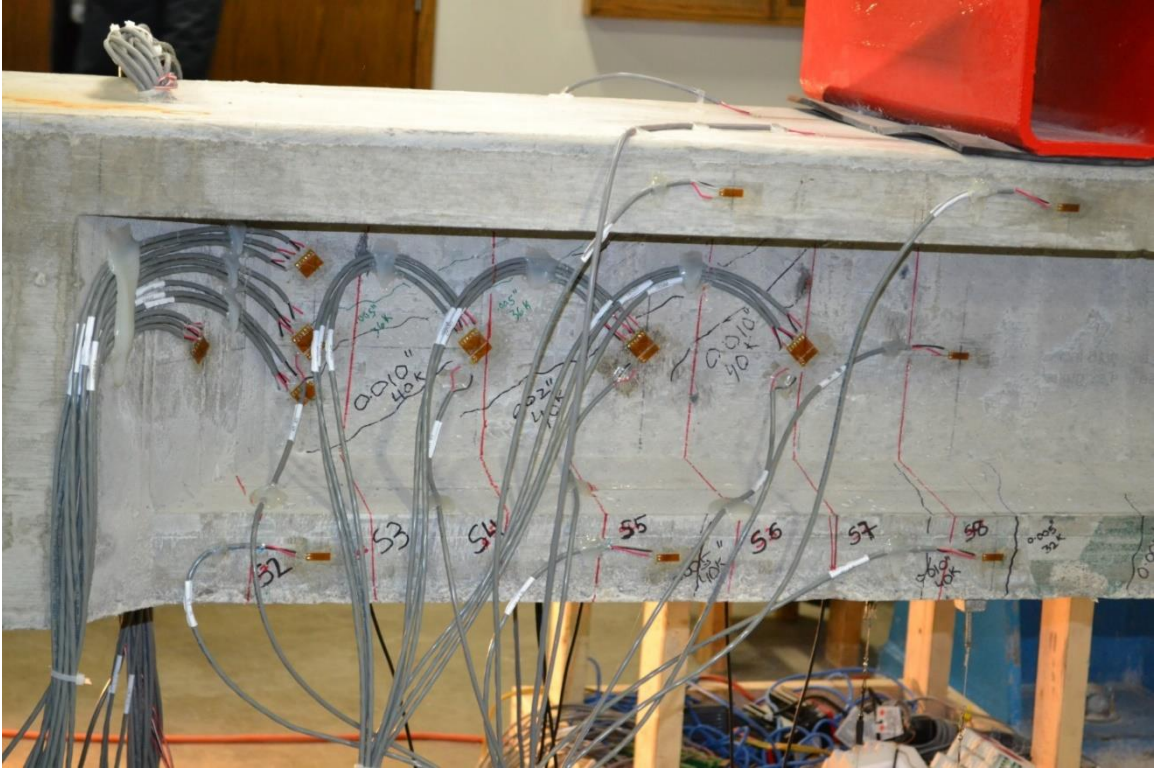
Crack development in shear span of Beam C-C-S-B
